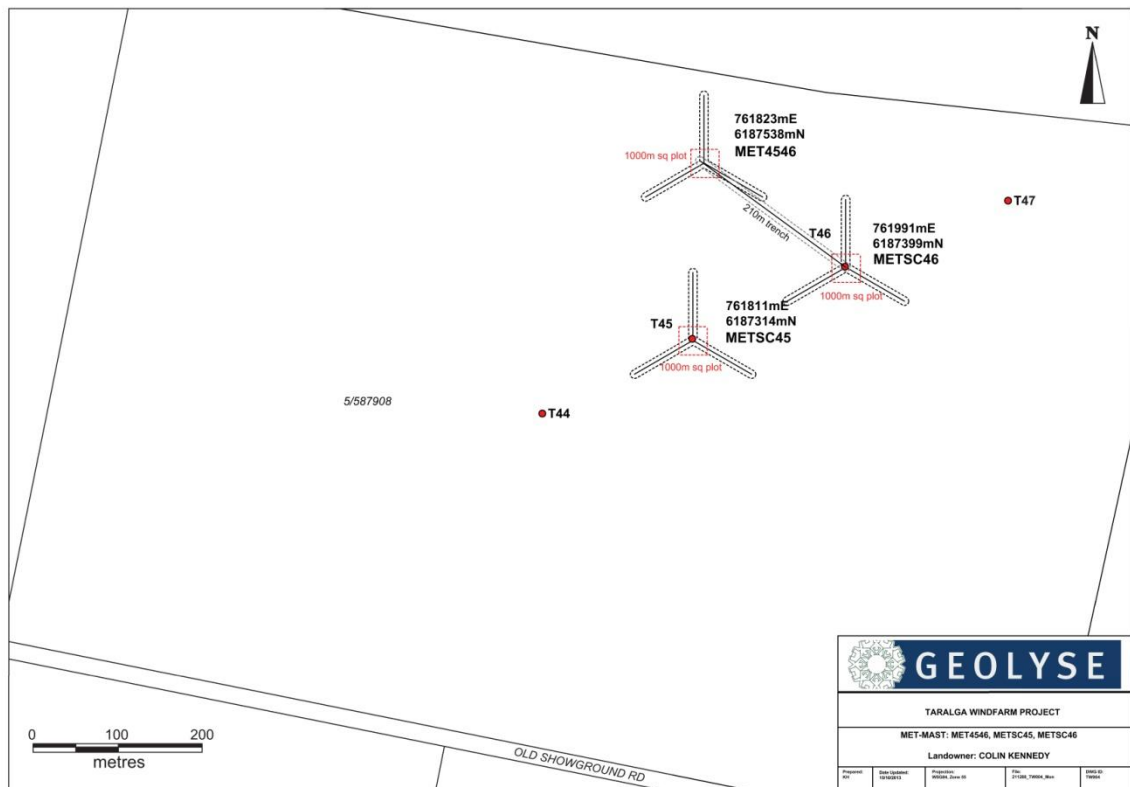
Plan of the proposed works at met-masts #MET4546, METSC46 (and proposed trench), and METSC45.
